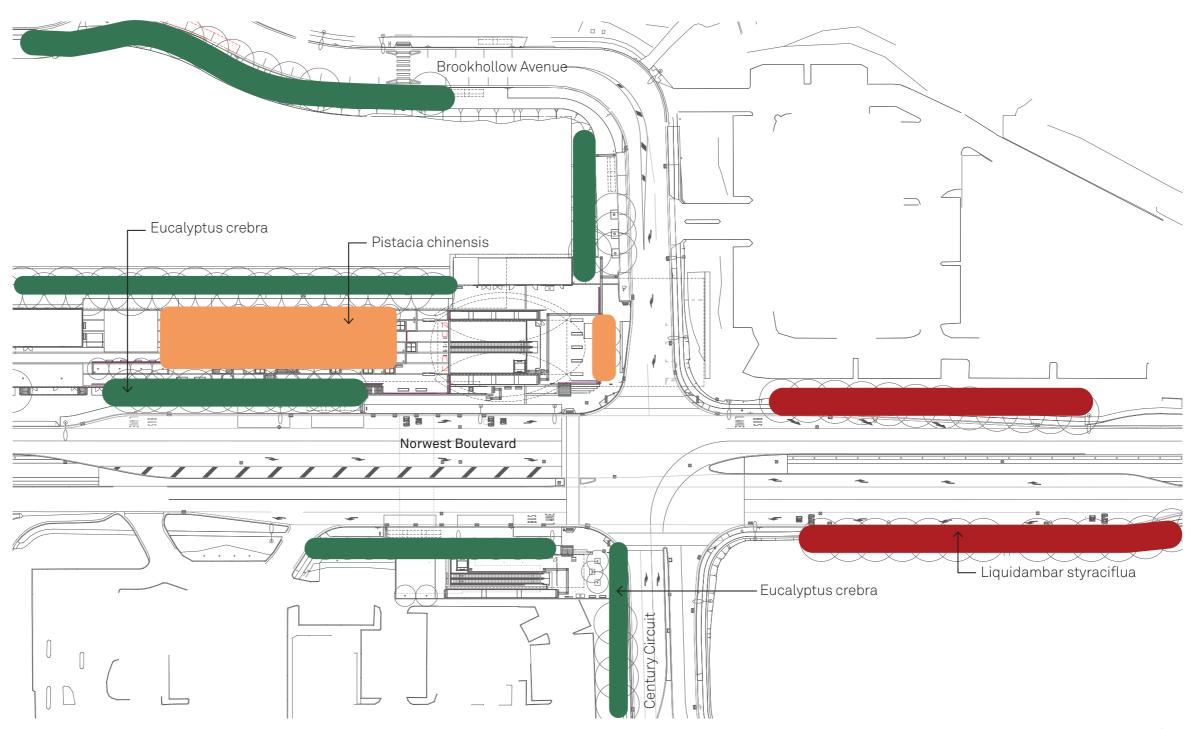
NRW_Norwest Planting Plan. Source: HASSELL.
